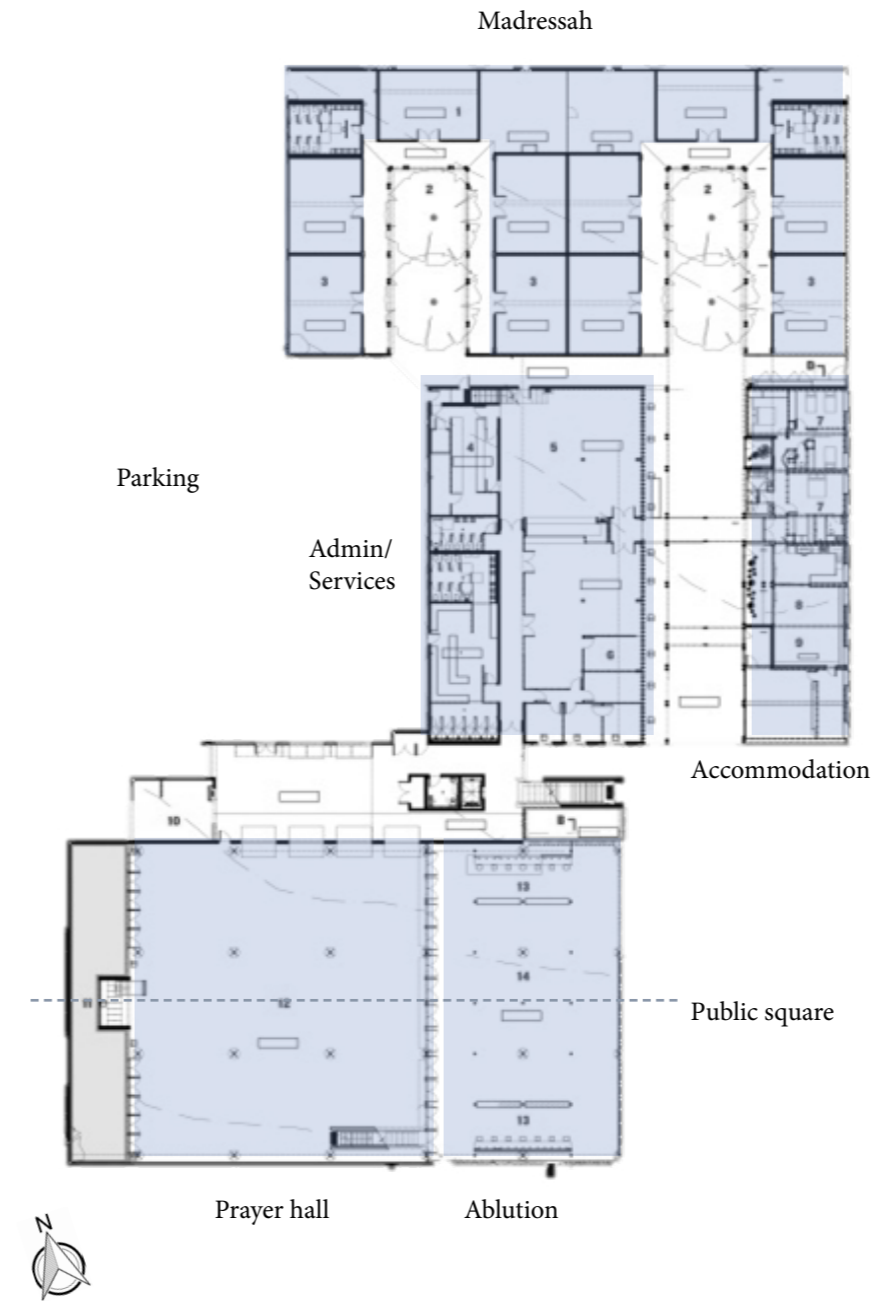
Layout of ground floor plan (Pintos, 2019: adapted by author).
